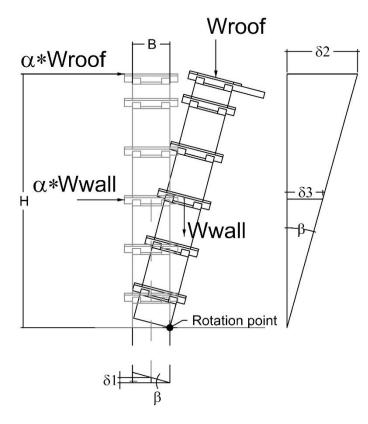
Roof force + Wall force - Overturning Wall - α critical
